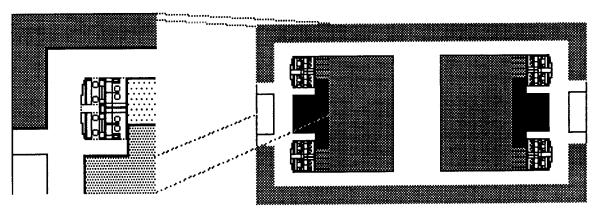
The image of a plan should carry over from floor to floor to facilitate wayfinding. Consistent patterns in the plan can be used to develop an overall image of the plan.
